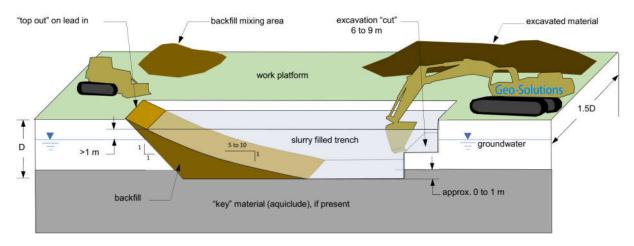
Schematic (cross-section) of slurry trench construction (courtesy of Geo-solutions, Inc.)
